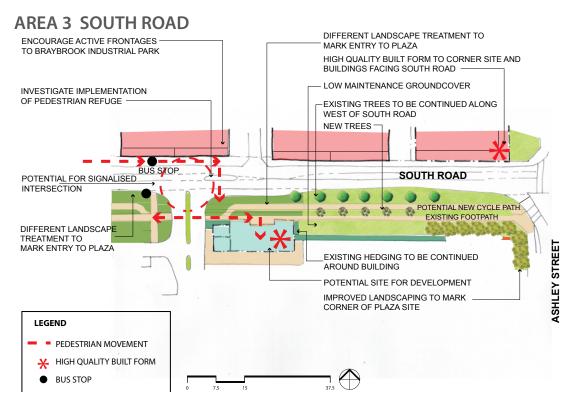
Proposed Plan - South Road entry to Central West Retail Plaza
